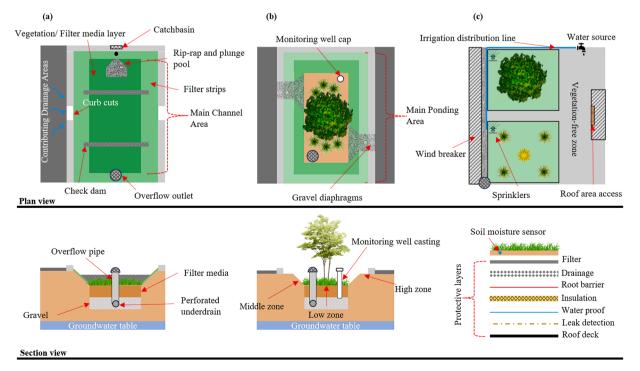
General plan and section views of (a): Bioswales, (b): Rain Gardens, and (c): Green Roofs.
